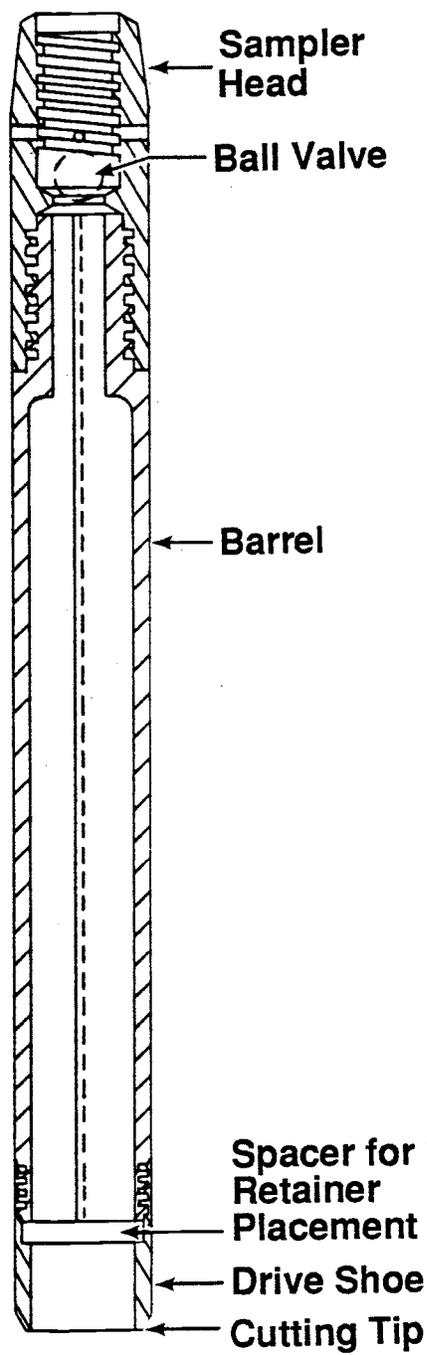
Split barrel drive sampler (after Diedrich Drilling Equipment, Inc.)
